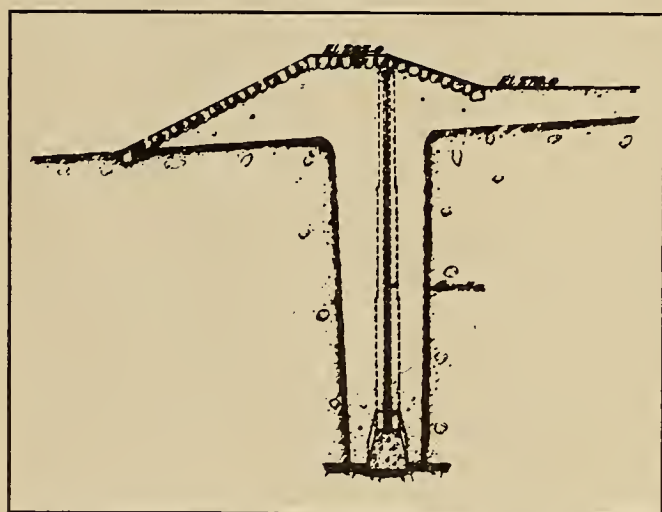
Sectional view of Gunite cut-off wall and earth fill.
